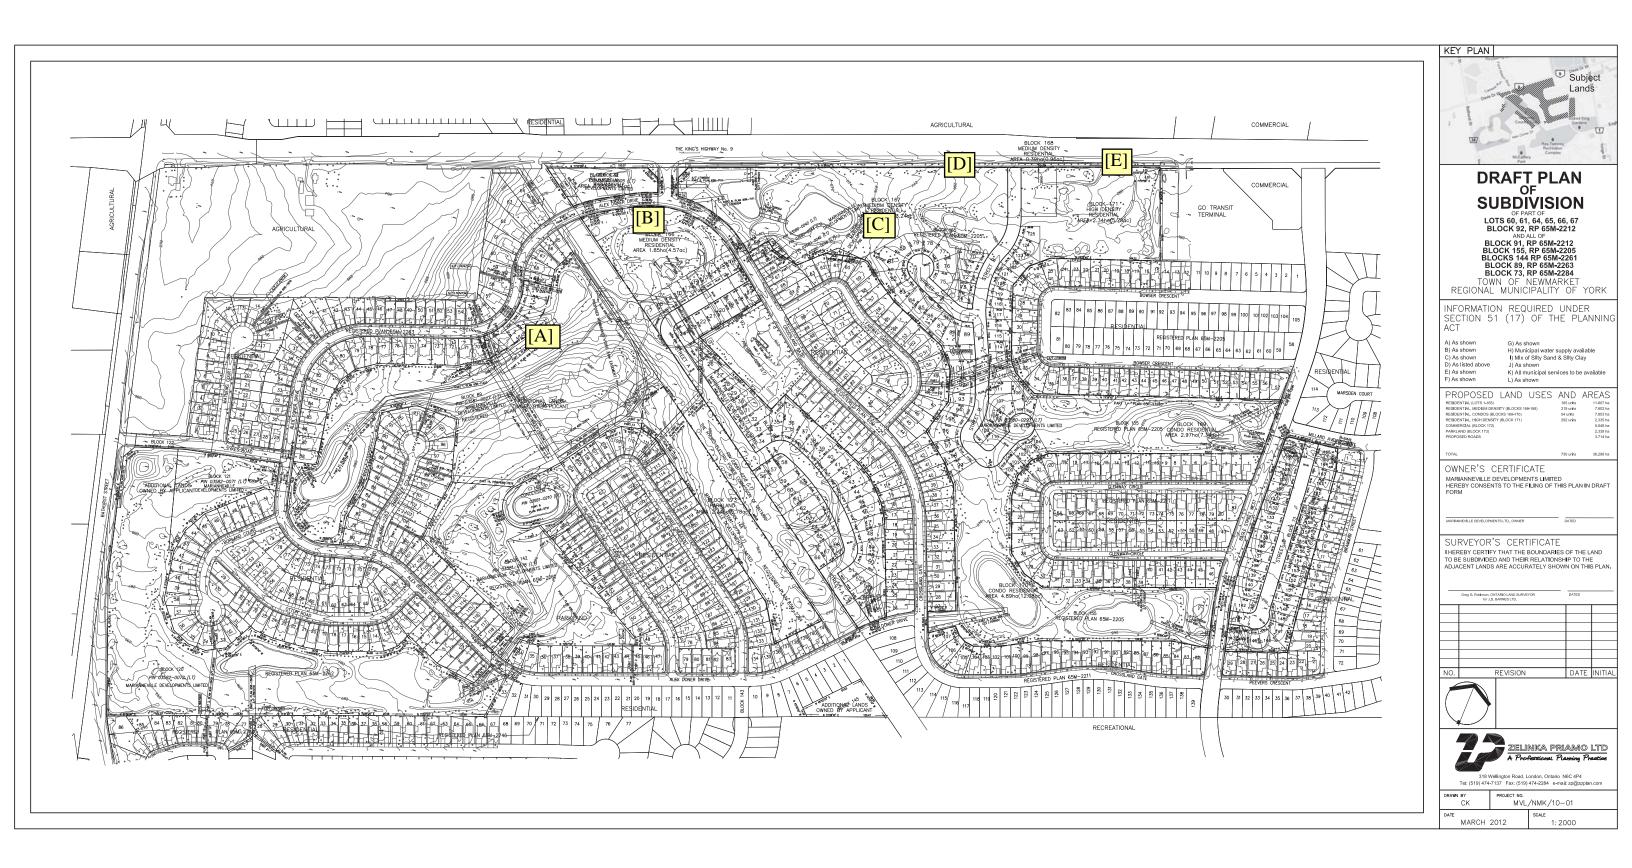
Draft Plan of Subdivision Showing Prediction Locations
